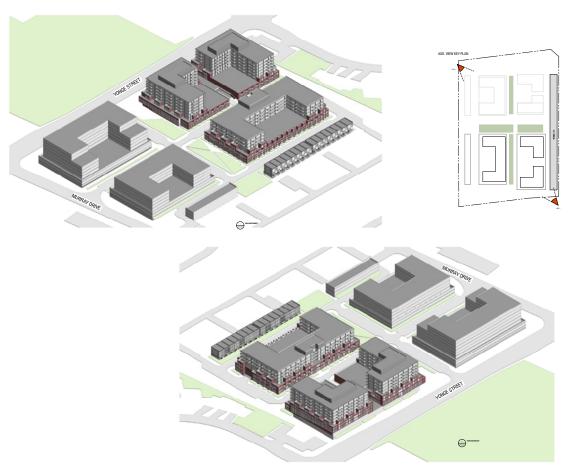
Isometric Views from phase 1 development illustrating building orientation and position across the site
